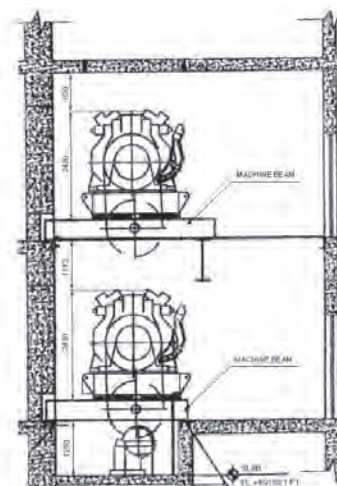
Vertical arrangement of oversized machines in the machine room, (Source: Otis Elevator Company)
